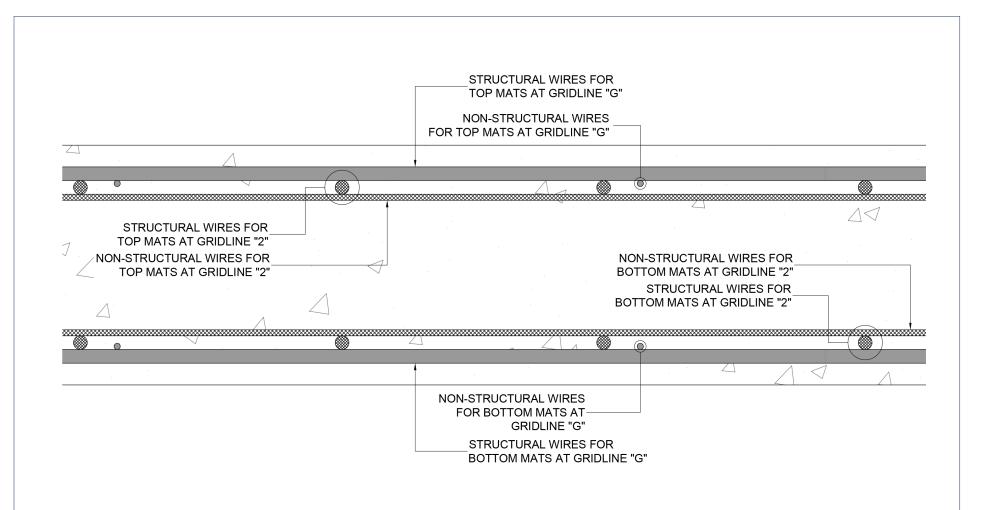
Typical detail of relative positioning of WWR mats. This example included design and detailing of Gridline G reinforcement only. These mats would have their structural wires nearest the top and bottom surfaces of the slab, with the non-structural holding wires towards the slab center. Positioning of reinforcement perpendicular to Gridline G (i.e., along Gridline 2 and those gridlines parallel to Gridline 2), would be nested to the inside of the Gridline G mats, again with their structural wires towards the slab top and bottom surfaces and non-structural wires towards the slab center. The WWR detailer is responsible for ensuring that positioning of non-structural holding wires – occurring co-planar with structural wires in the orthogonal direction – does not interfere with said structural wires.
